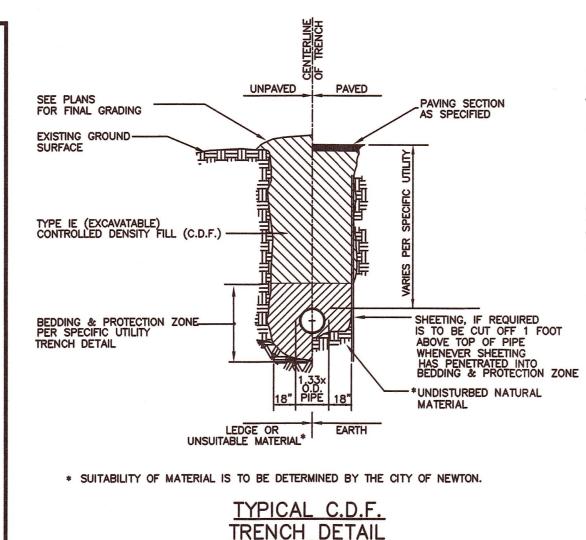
DETAIL SHEET NEWTON, MASSACHUSETTS SHOWING PROPOSED CONDITIONS AT #57 ADAMS AVENUE
